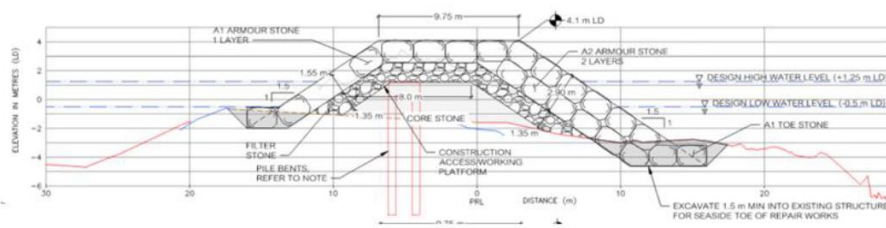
Emergency Repair Works – Full Repair Cross-Section
